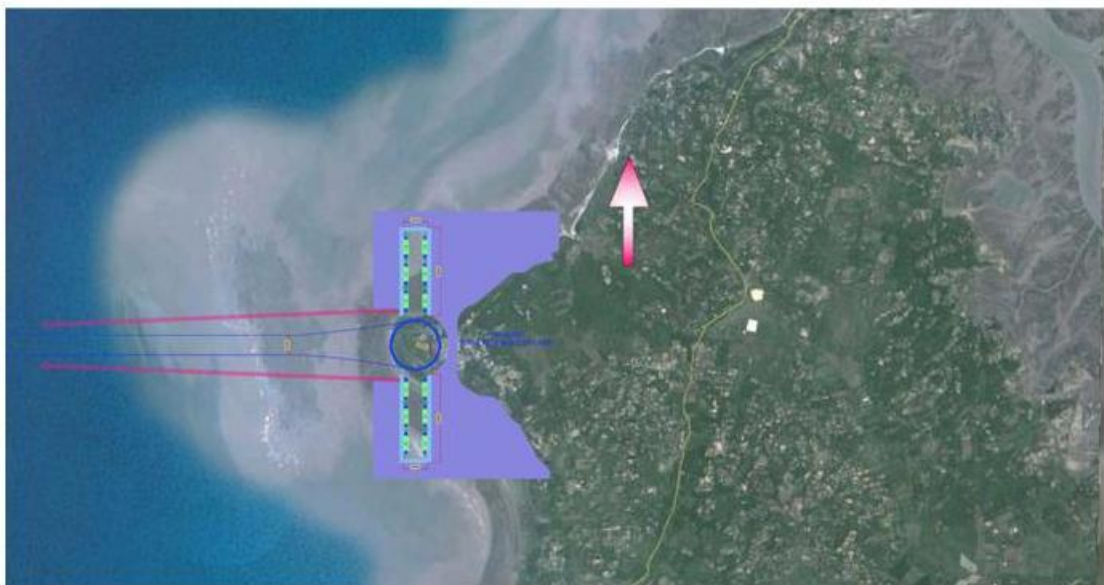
Conceptual layout of the facility at Wadhvan Point
